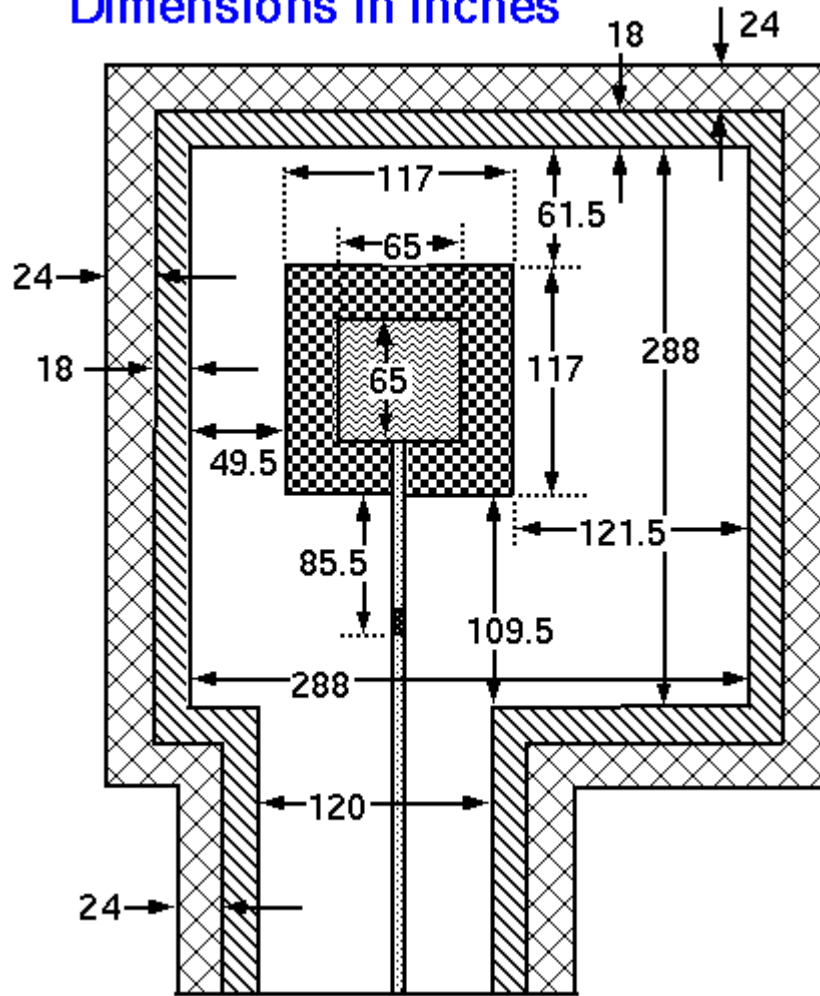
shows the floor plan of the model. The walls, ceiling, and floor are composed of ordinary concrete. The air in the access shaft, target room, and tunnel is at a density appropriate to a 7,000 feet altitude. Appendix A lists the MCNP and LAHET material descriptions.
